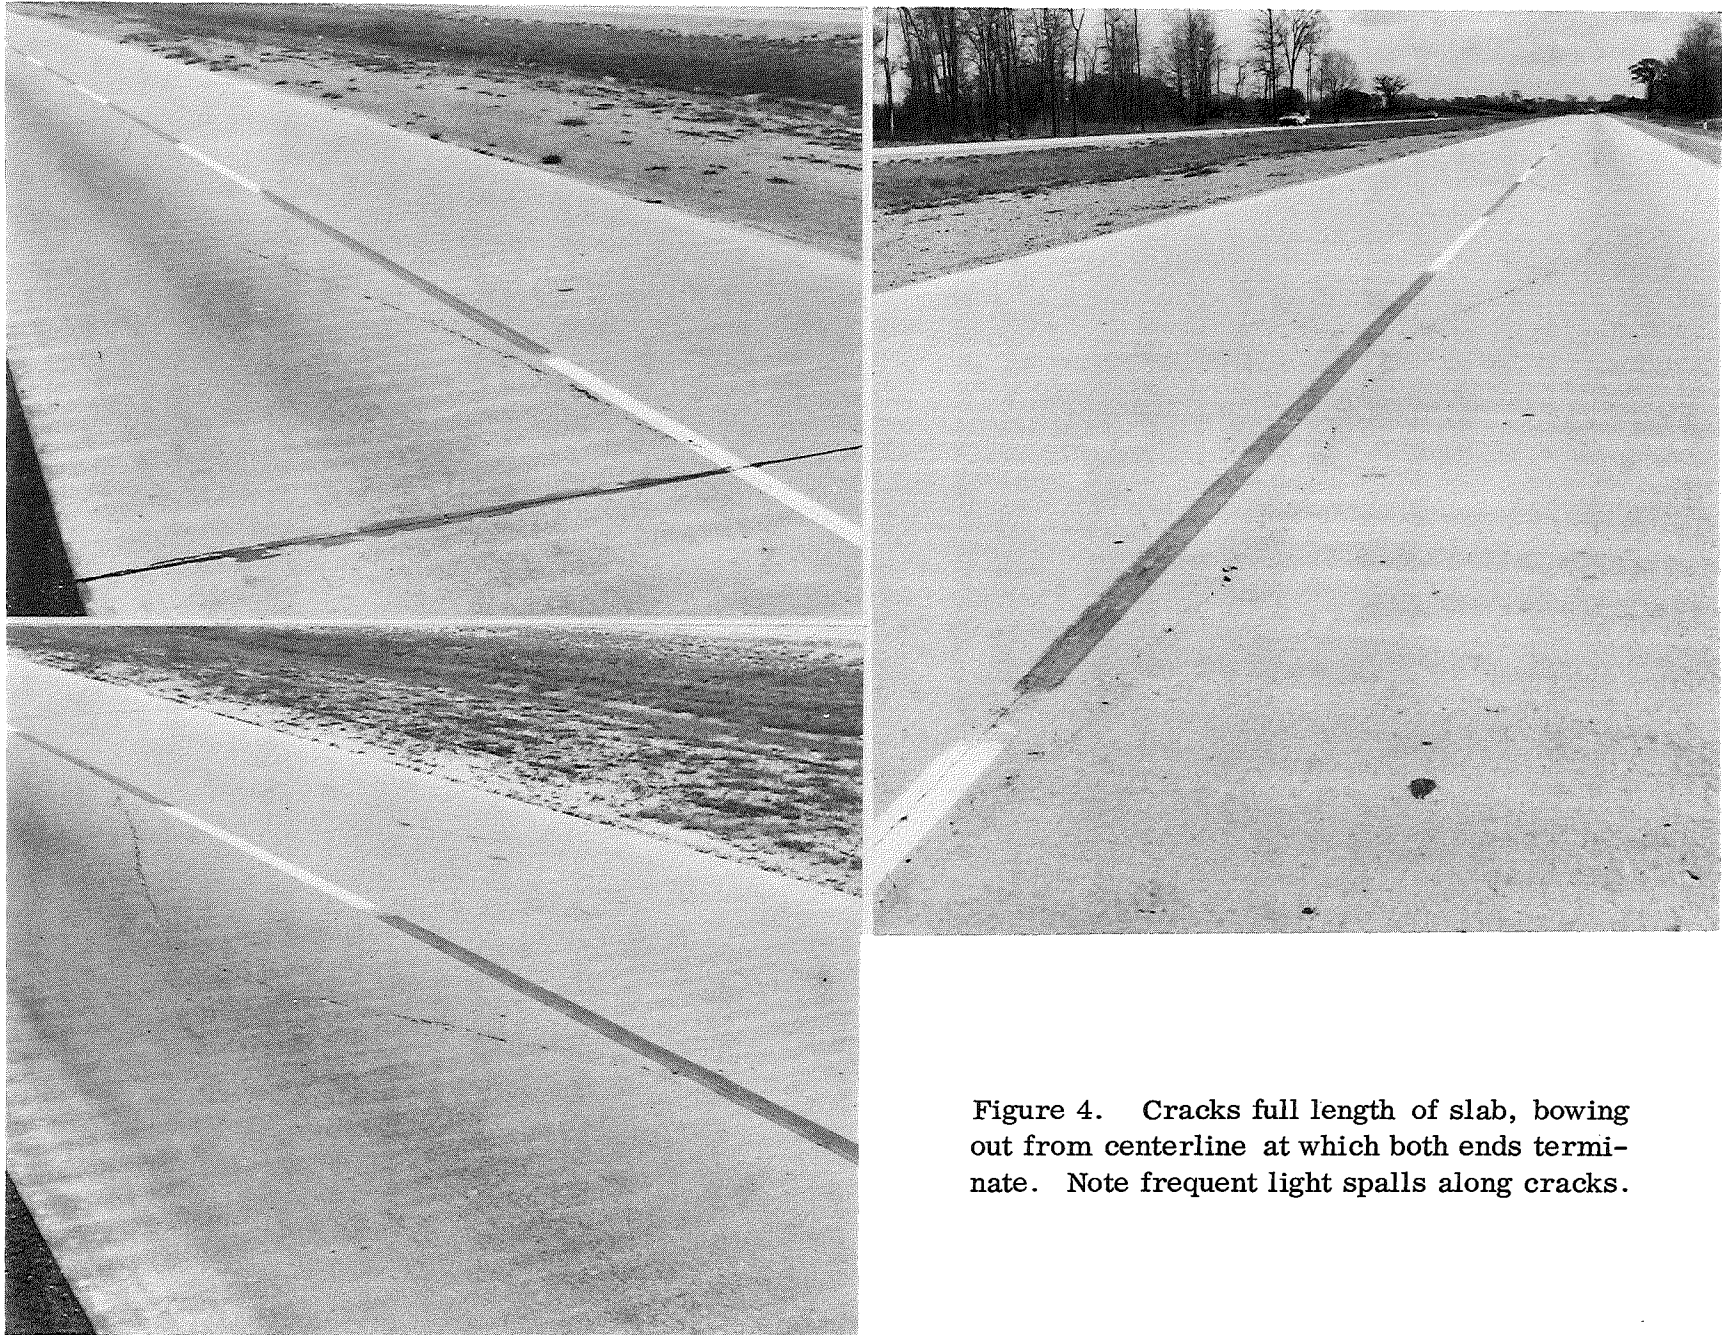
Cracks full length of slab, bowing out from centerline at which both ends terminate. Note frequent light spalls along cracks.
